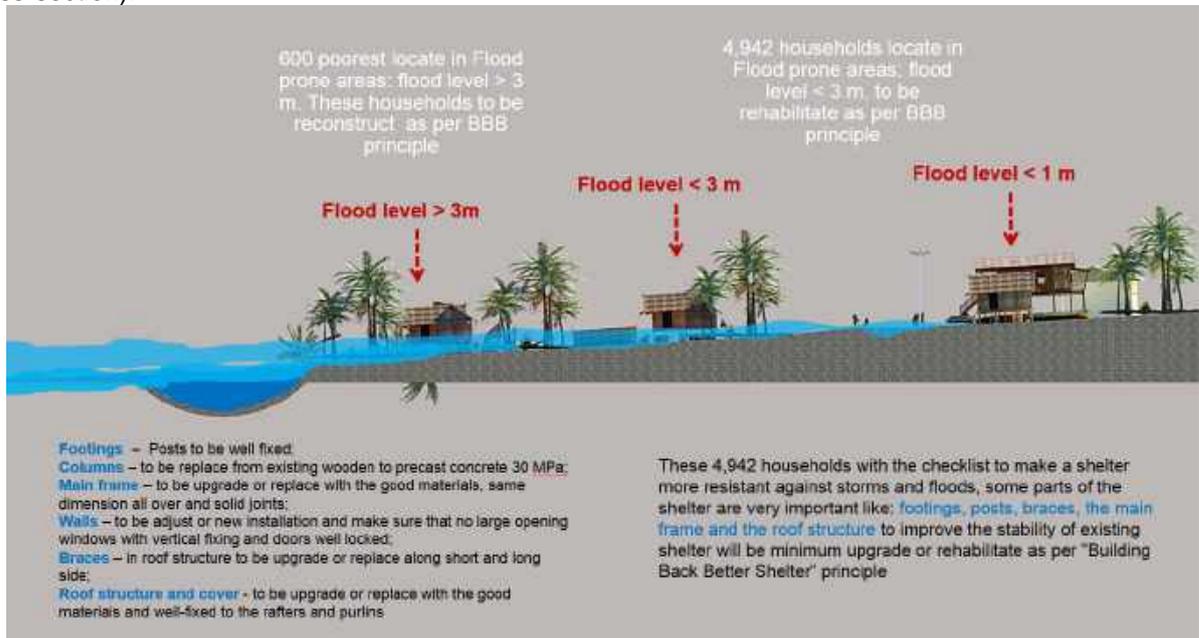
Resilient Demonstration Houses: In each of the six target towns one demonstration house will be built, based on the "Building Back Better and Safer" model. The houses will offer an opportunity for local carpenters and masons to acquire new skills and knowledge on climate resilient house construction. People will be given technical information and instructions that guide them through the entire process of building resilient shelter, using materials available in the region. People will also acquire the knowledge to upgrade existing houses by way of reconstruction or rehabilitation.
